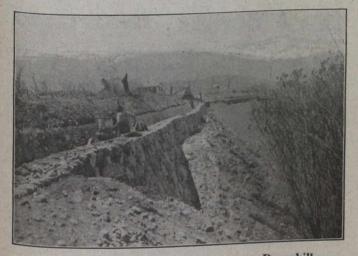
Showing Retaining Wall on Downhill Side of Canal
